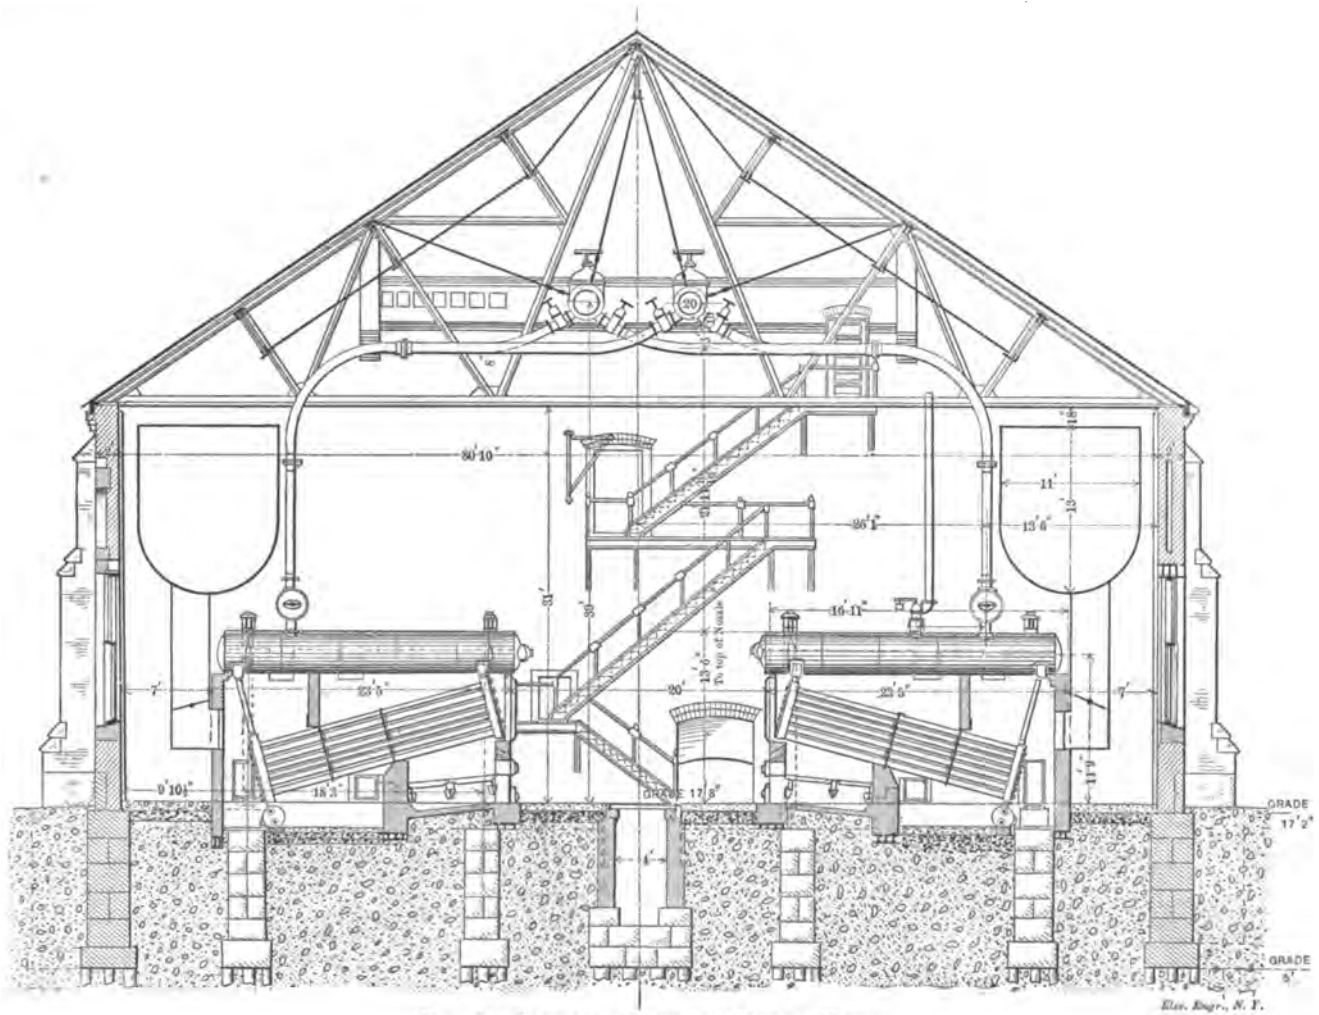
SECTIONAL VIEW OF BOILER HOUSE.
